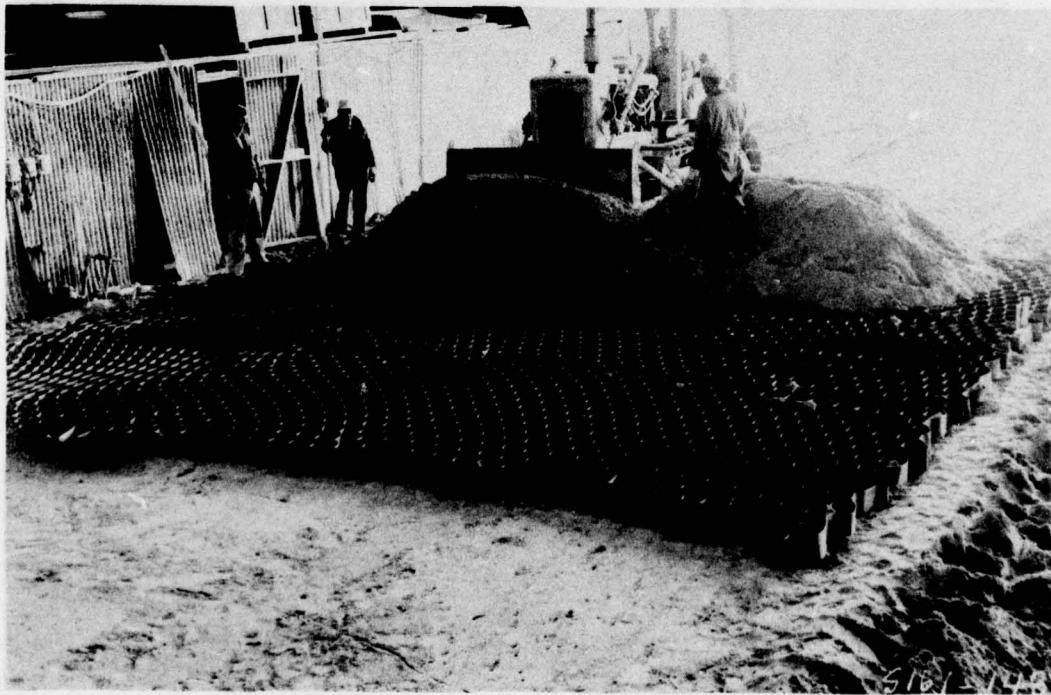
Spreading sand into 6-in. grids with D-4 tractor
